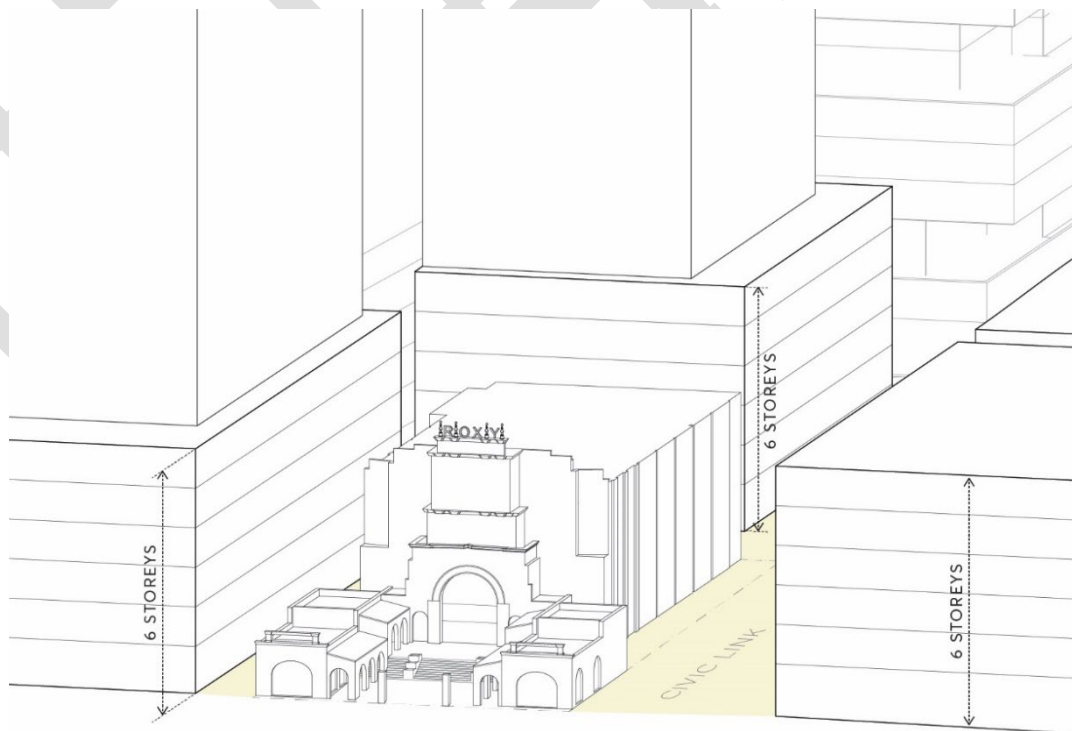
The Roxy Framed By 6 Storey Street Walls
